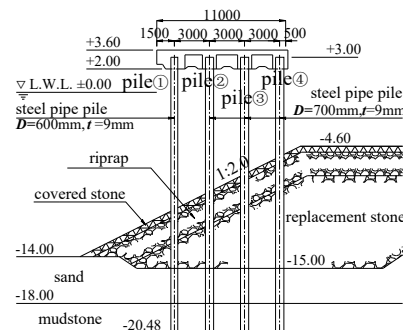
Sectional drawing and soil layer's drawing of wharf structures.
